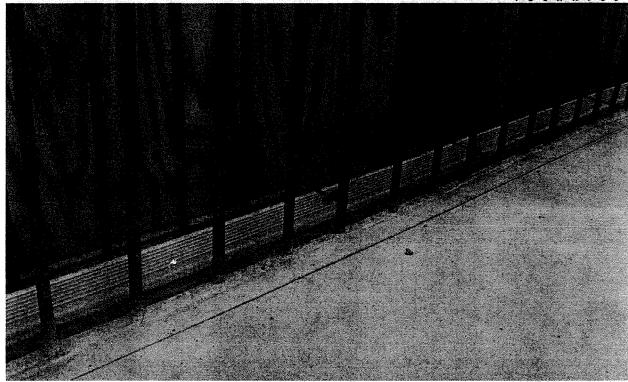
View of a water stop installed along the construction joint located between the walls and the foundation of the tanks.
